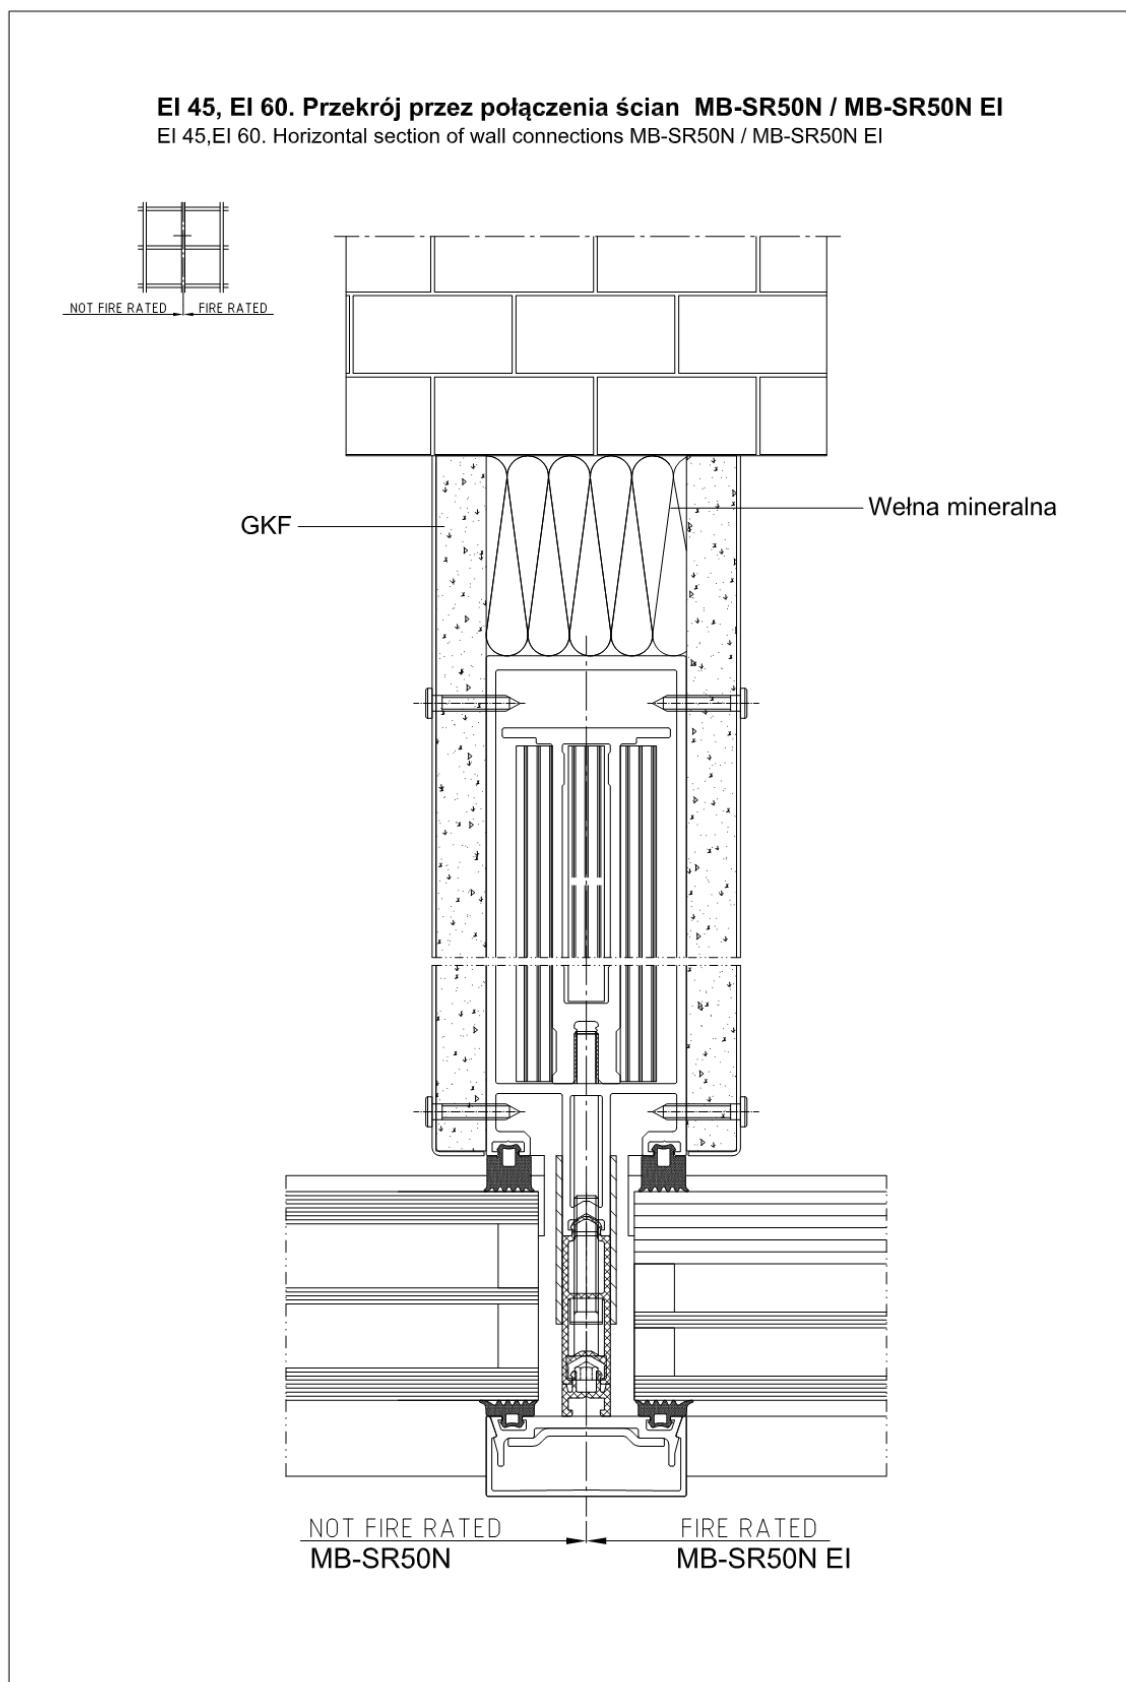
Cross-section through the connection of the MB-SR50N EI EI60 system wall with non - fire rated MB-SR50N system wall
